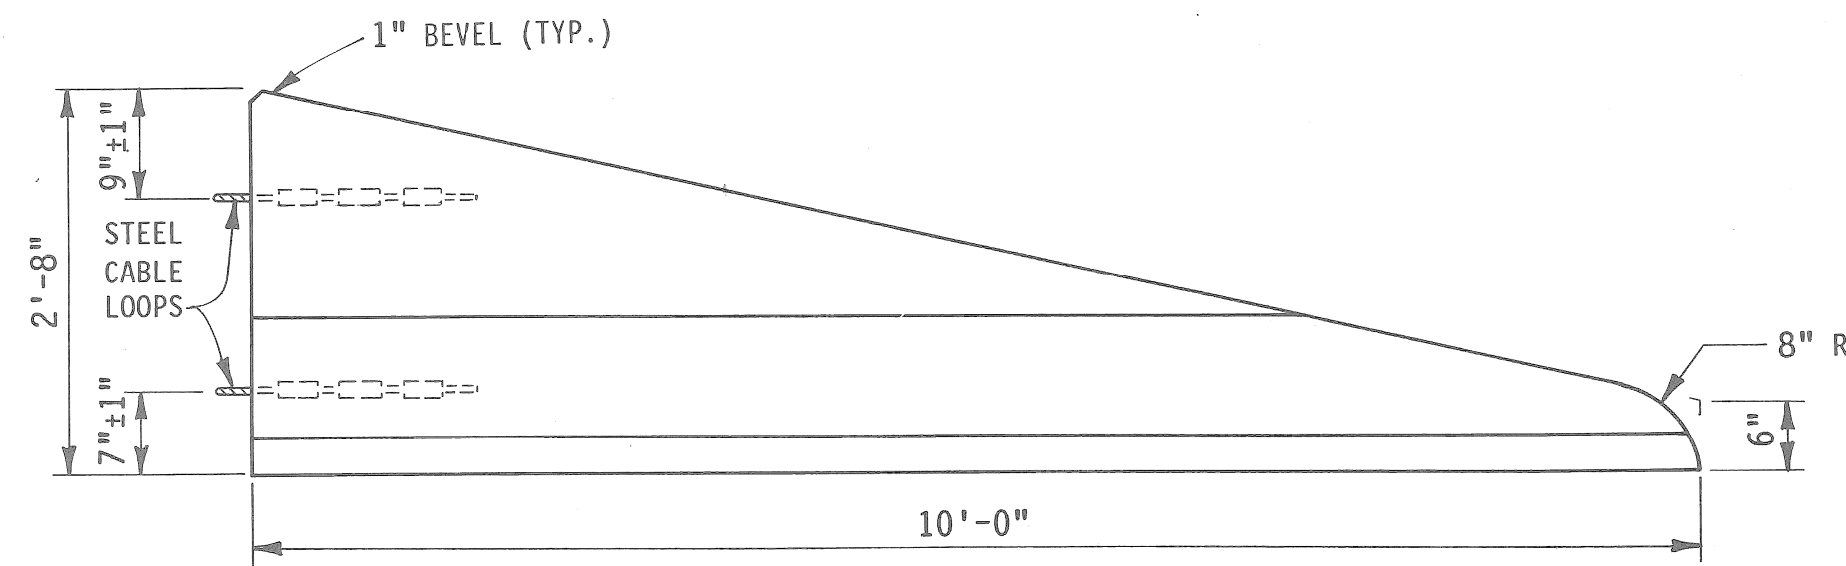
DETAILS FOR CONNECTING TEMPORARY CONCRETE BARRIER CONNECTING SECTION TO CONCRETE BARRIER
